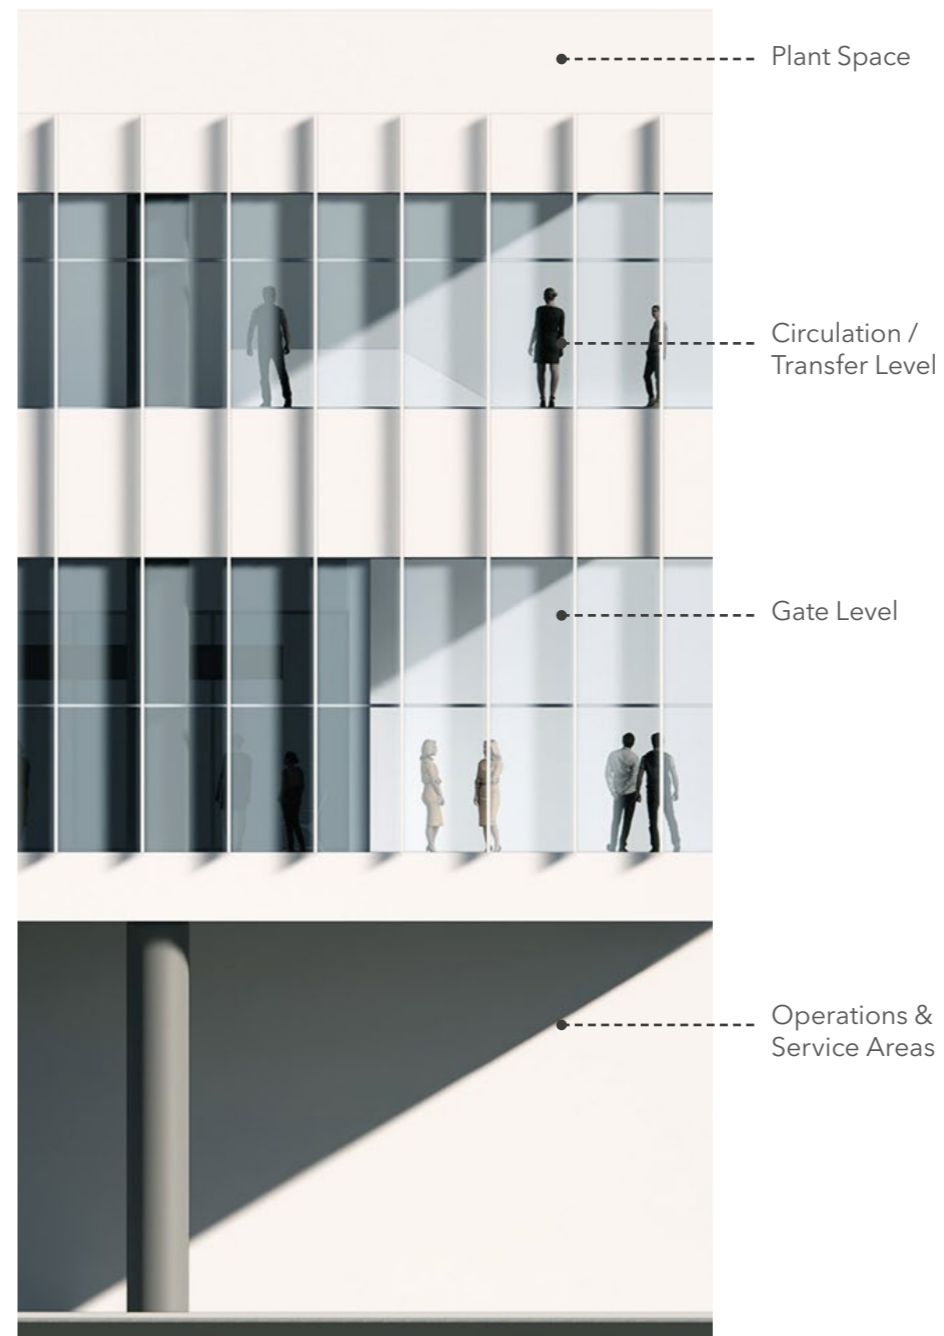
Indicative Elevation showing Typical 'Pier' Design
